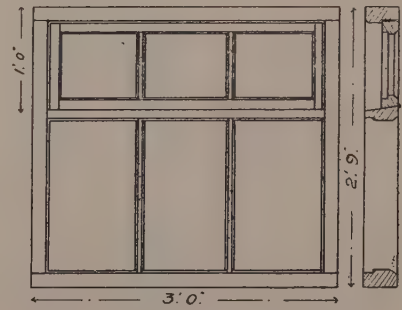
ELEVATION AND SECTION OF WINDOW AND VENTILATOR.
